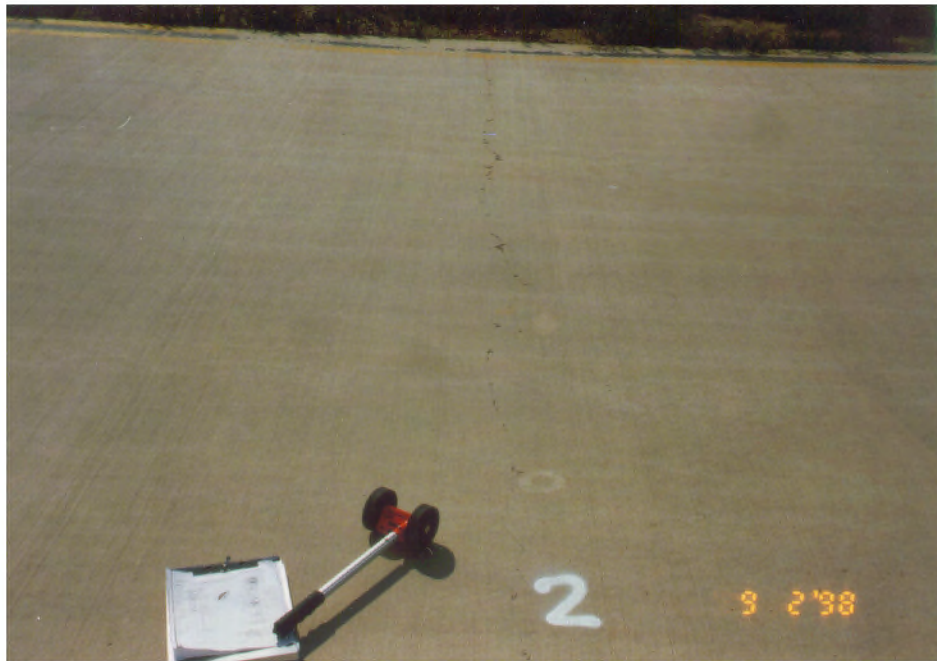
CRACK NO. 2 IN THE PRESTRESSED PAVEMENT, A TRANSVERSE CRACK LOCATED NEAR THE CENTER OF THE PAVEMENT SECTION (SEPT. 1998)
